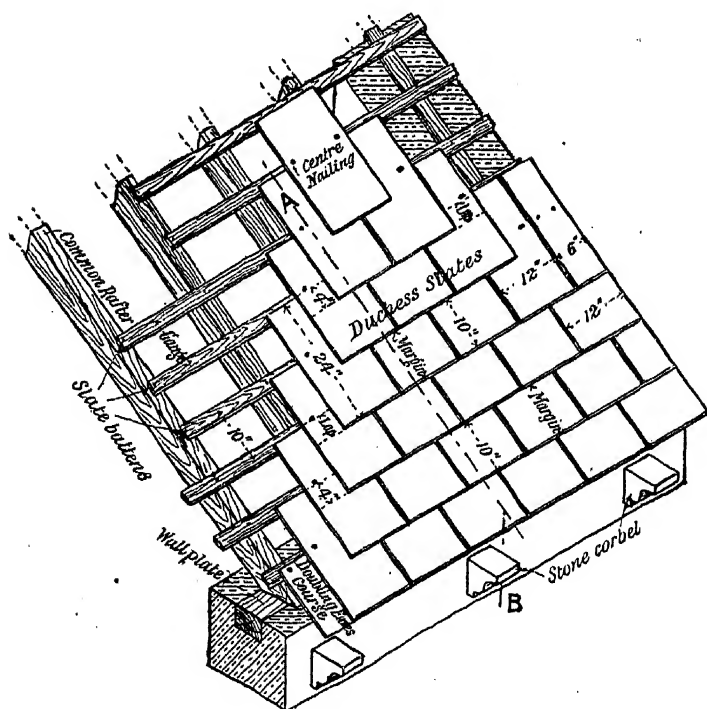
Duchess Slating, Centre-nailed, and laid on Battens to 4" Lap.
